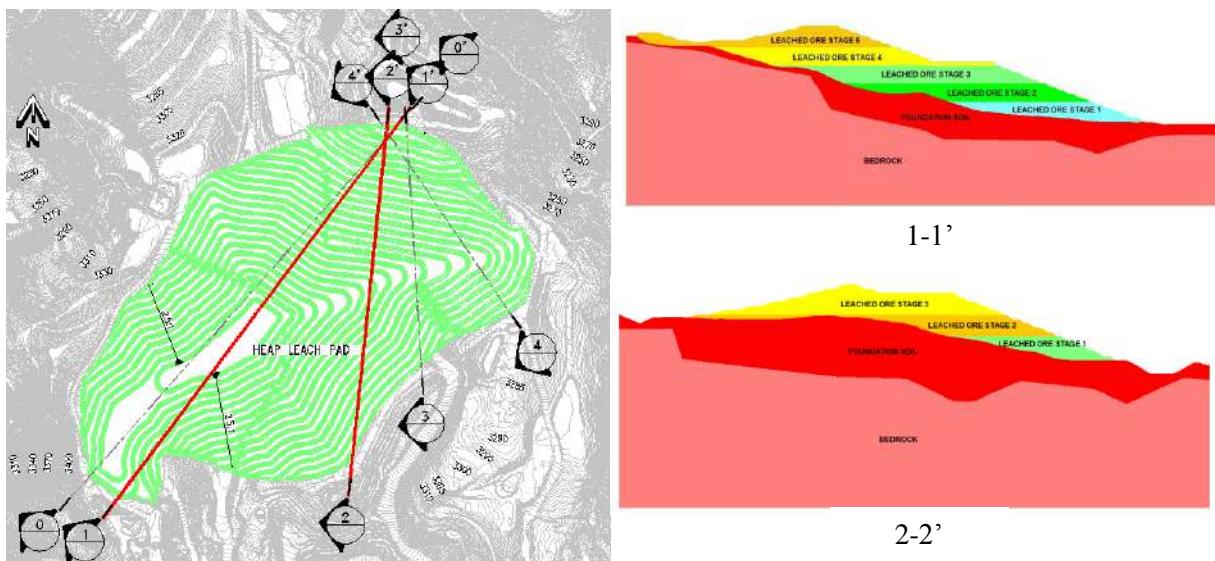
Plan view and cross-sections 1-1' and 2-2' of the heap leach pad
